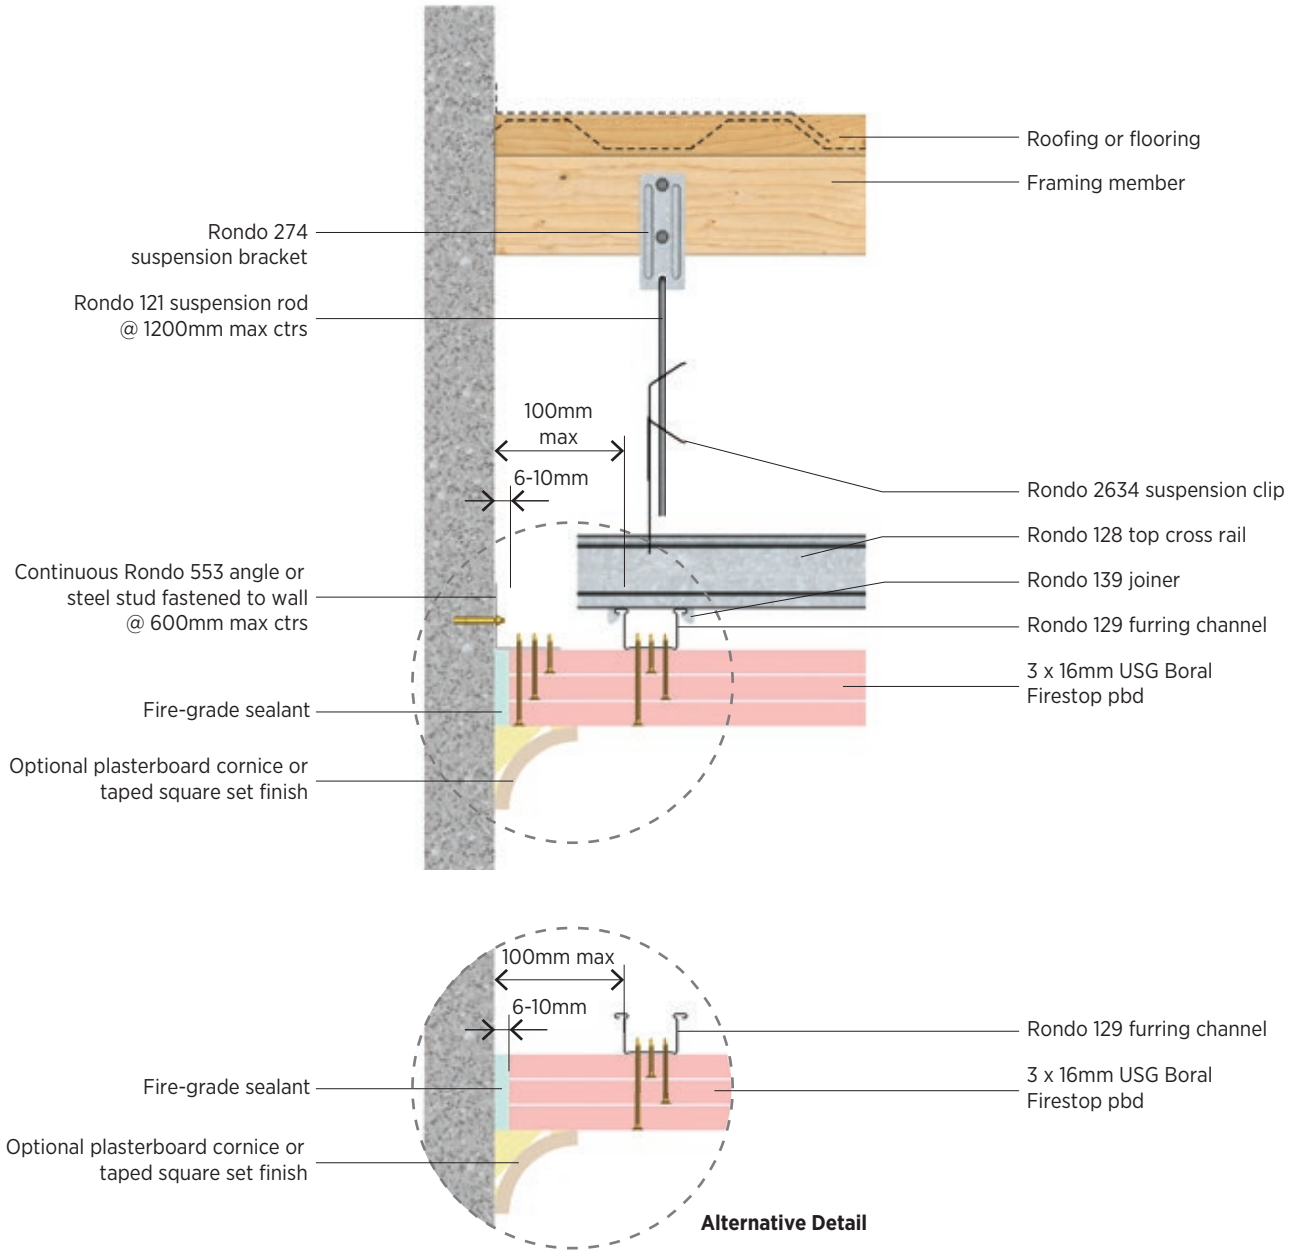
Typical Perimeter Detail – FRR 90/90/90
